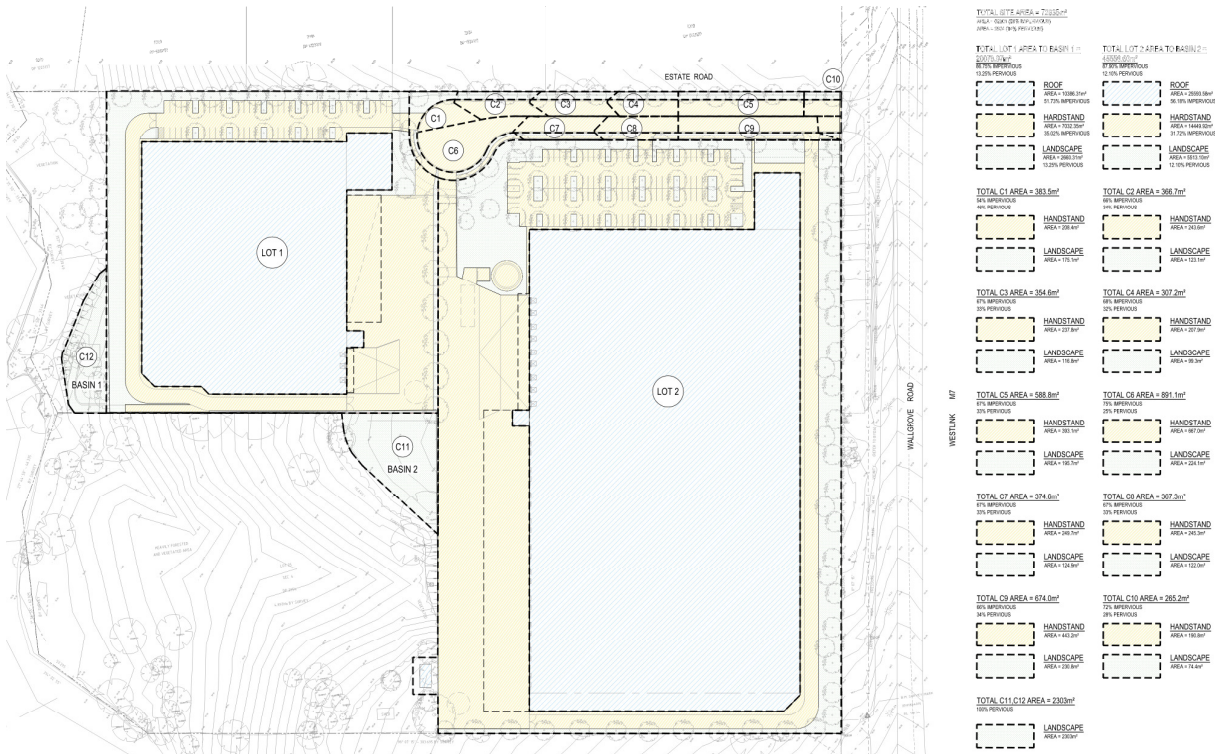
Stormwater Catchment Plan, H&H 2025 (drawing no. 230804\_DA\_C250)
